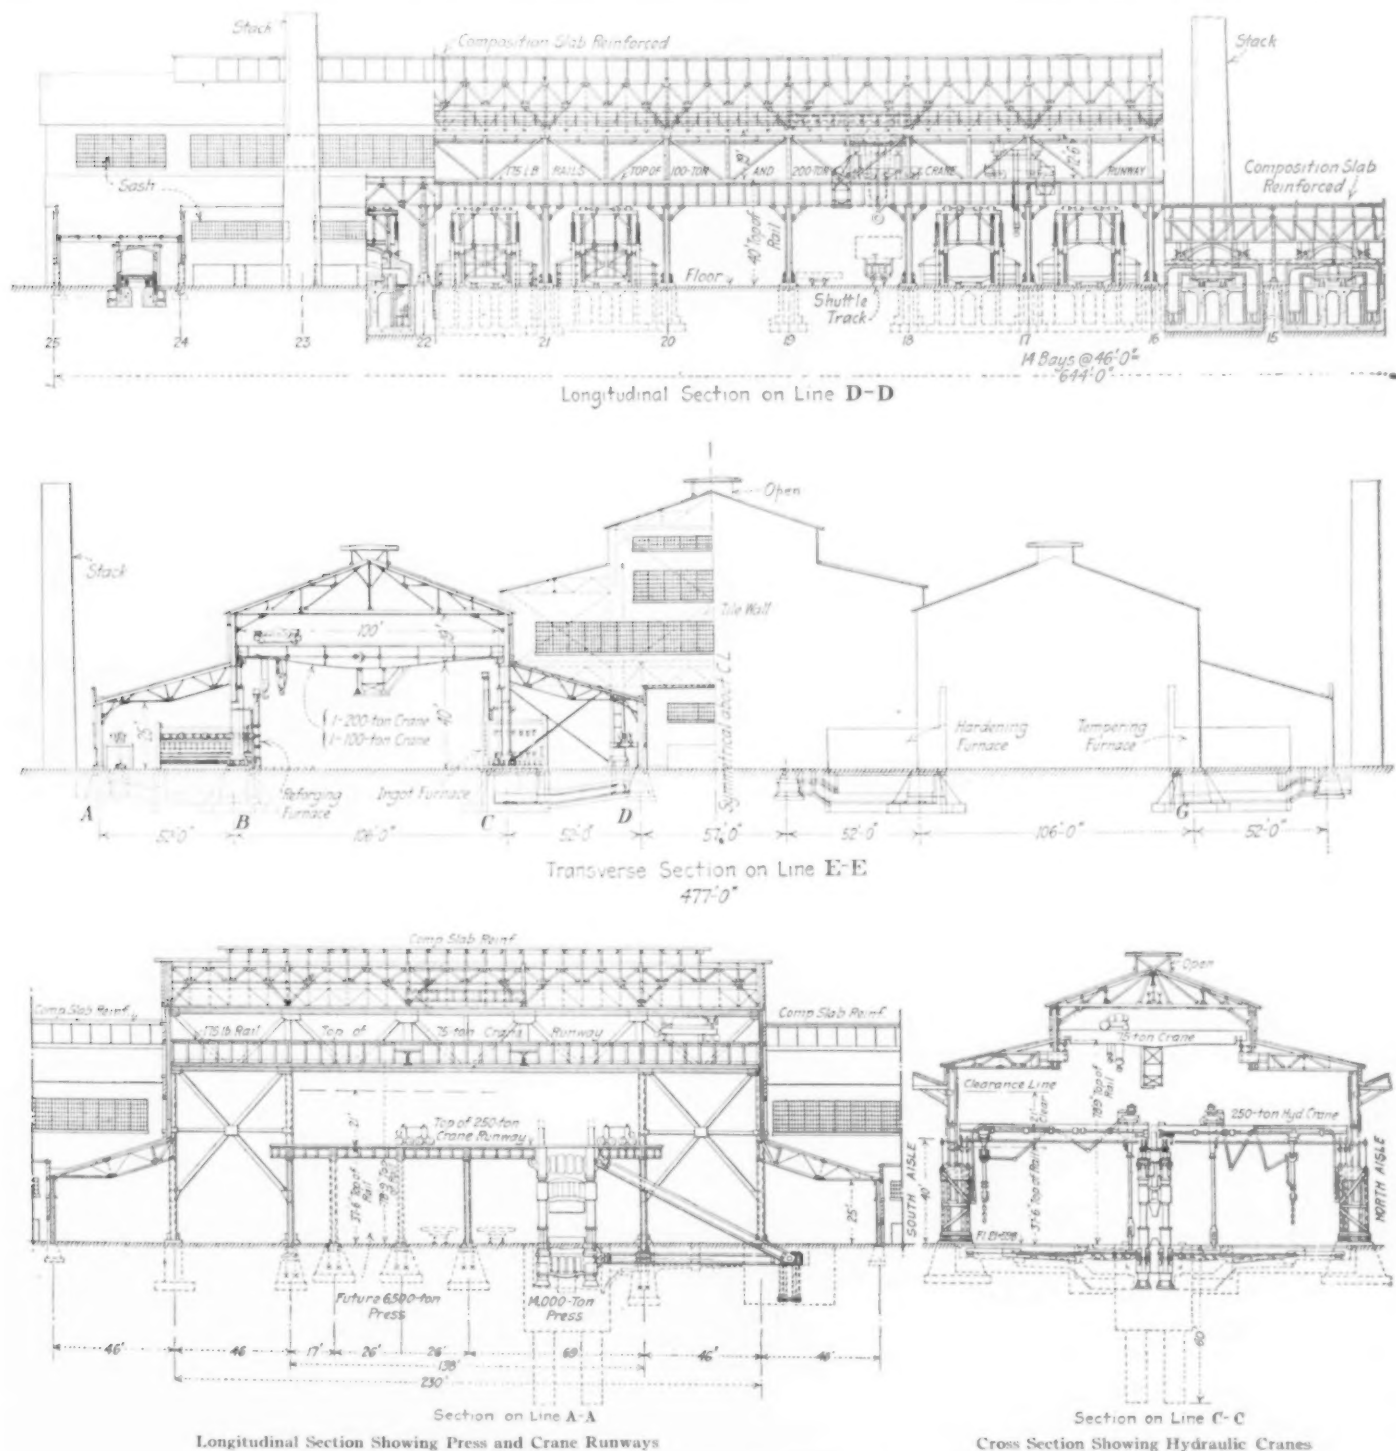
SECTIONS OF FORGE AND FURNACE BUILDING
